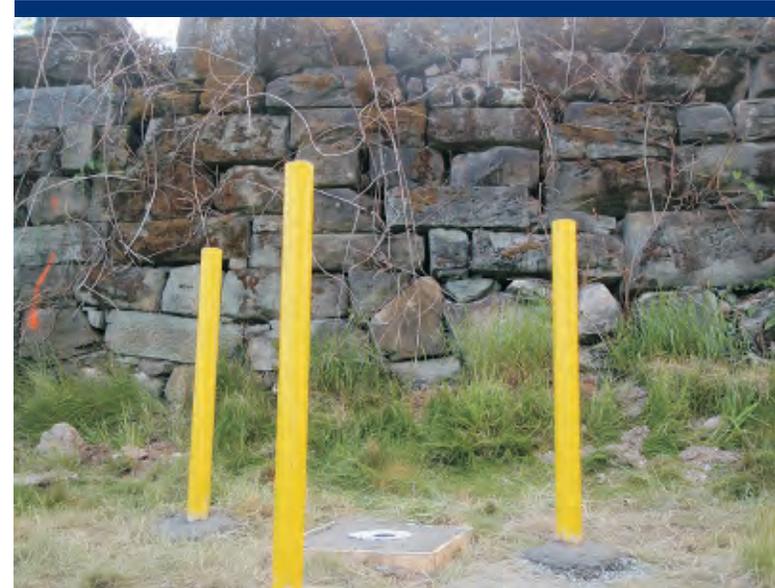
Monitoring well MW10 with bollards. Note concrete and metal pipes near top of retaining wall.
